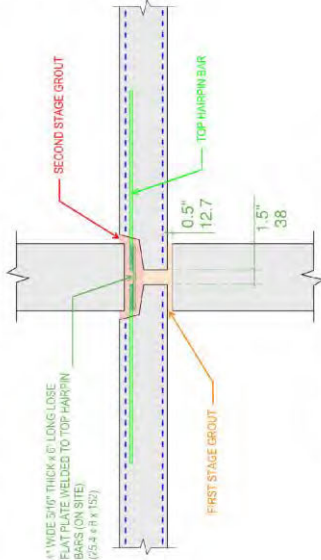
Typical Panel to load-bearing wall junction cross-section.
